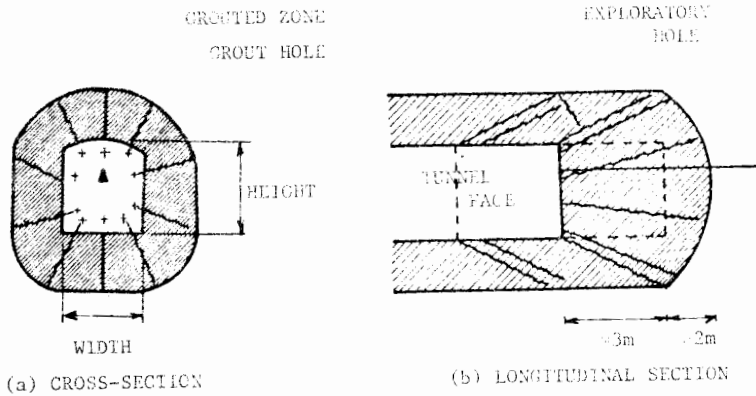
GROUTING FROM INSIDE OF TUNNEL
